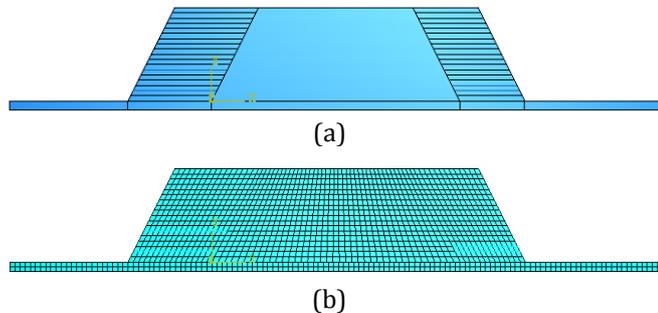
The model with 18 layers of reinforcement in south (right) and north (left) slope (a) and the finite element discretization (b)
